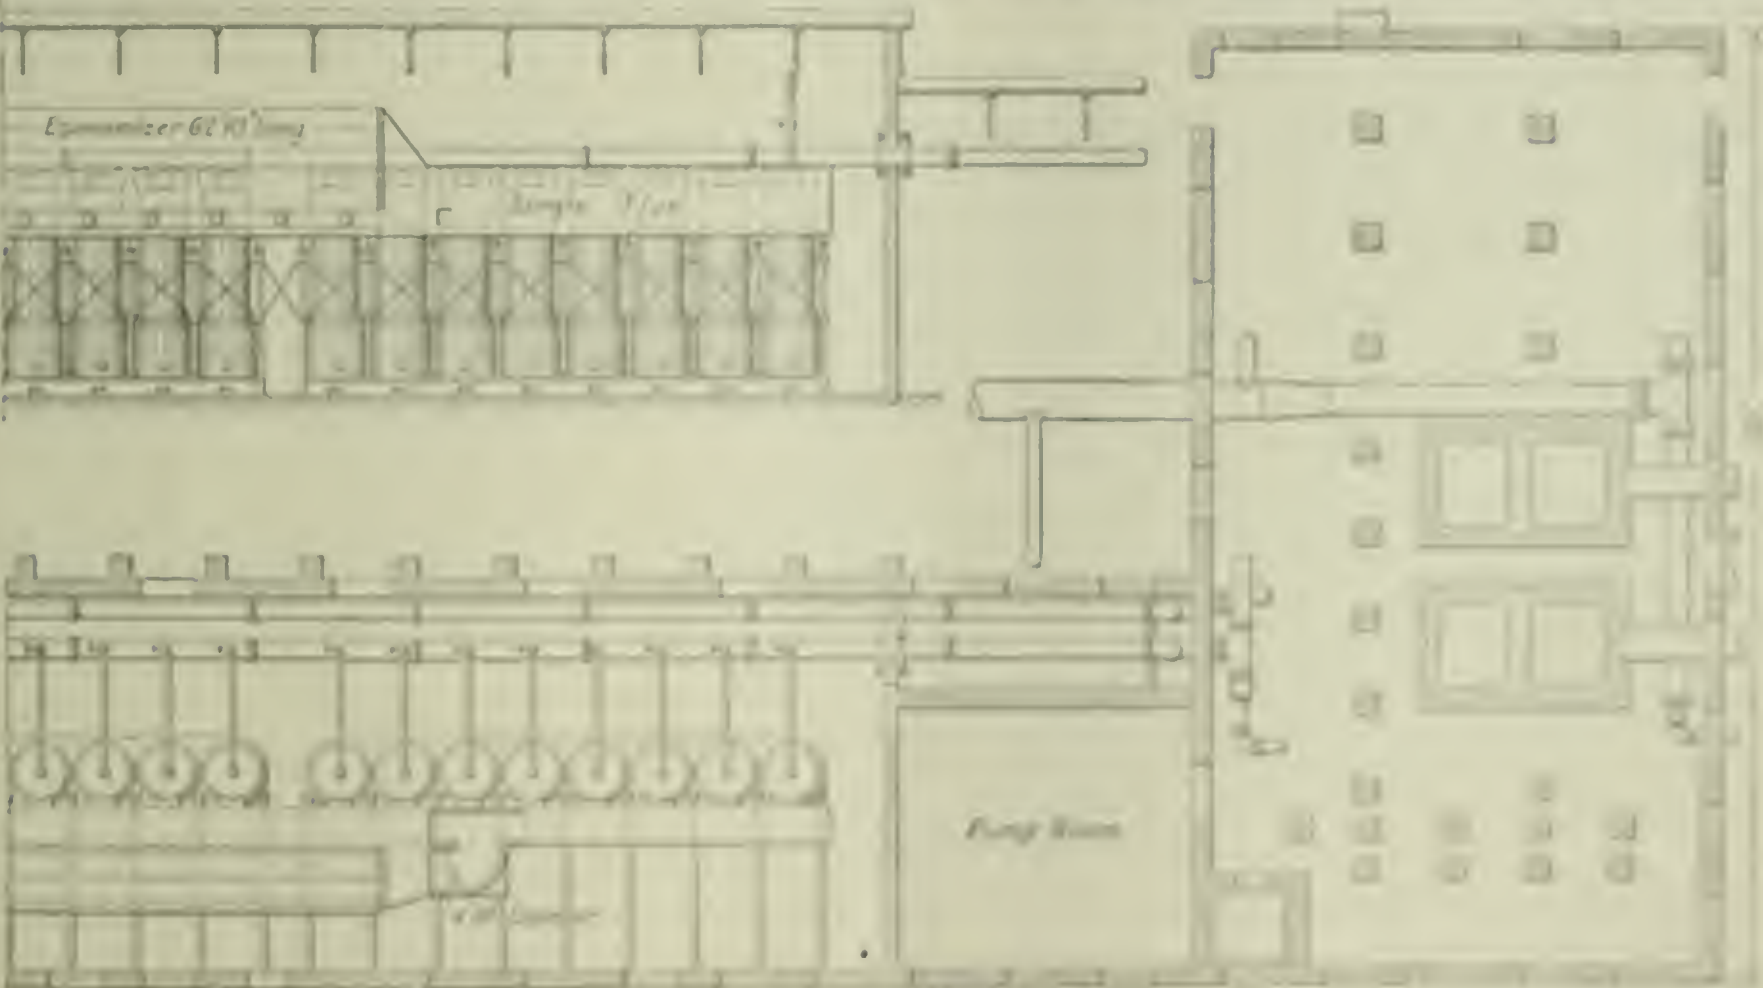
PLAN AND ELEVATION BY SHORT HALL OF BOILER ROOM
